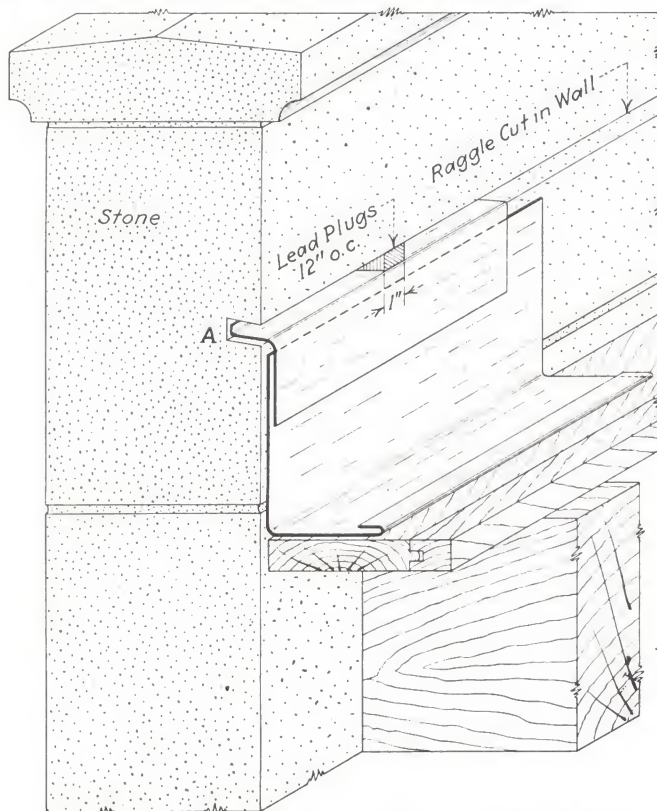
BASE AND CAP FLASHINGS JOINING A STONE WALL
